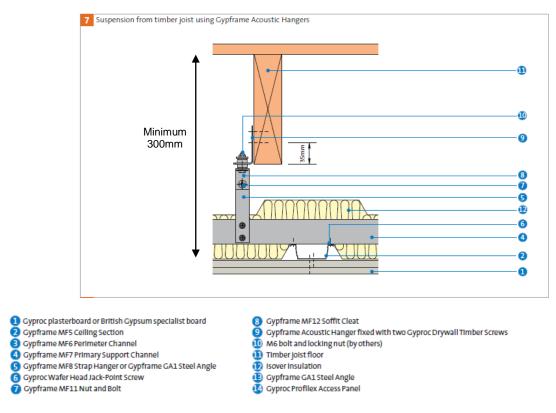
Suspended ceiling on acoustic hangers (MF ceiling shown)
